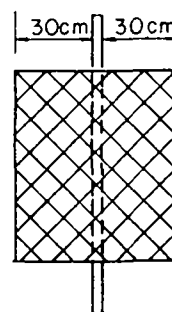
Chicken wire reinforcing for repairing cracks in masonry work
